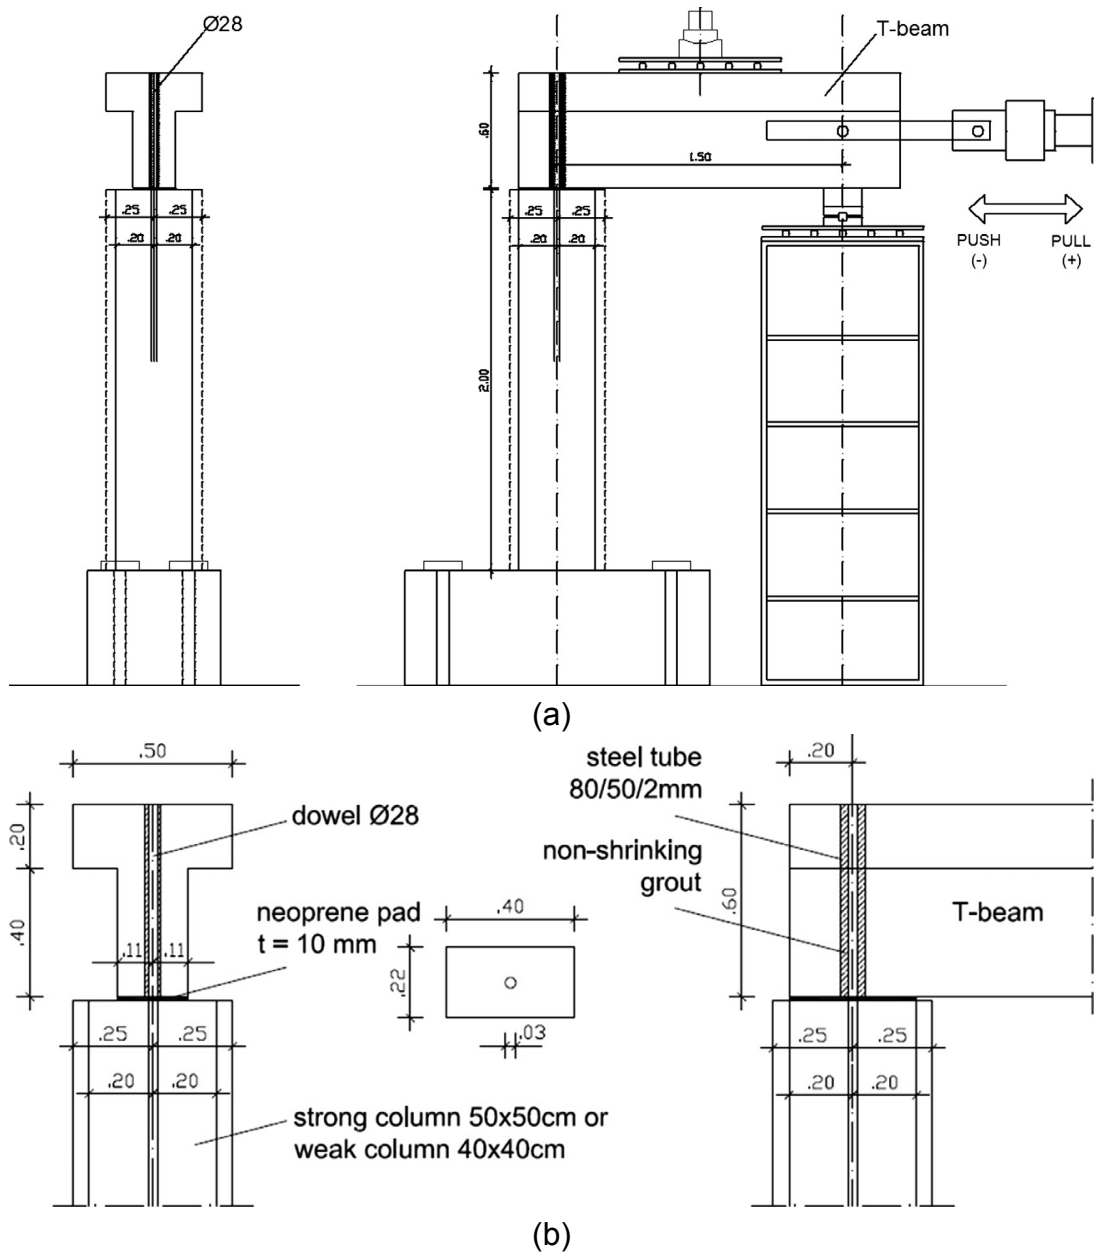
(a) Experimental set-up pinned dowel connection and (b) detail of beam-column connection [47]
